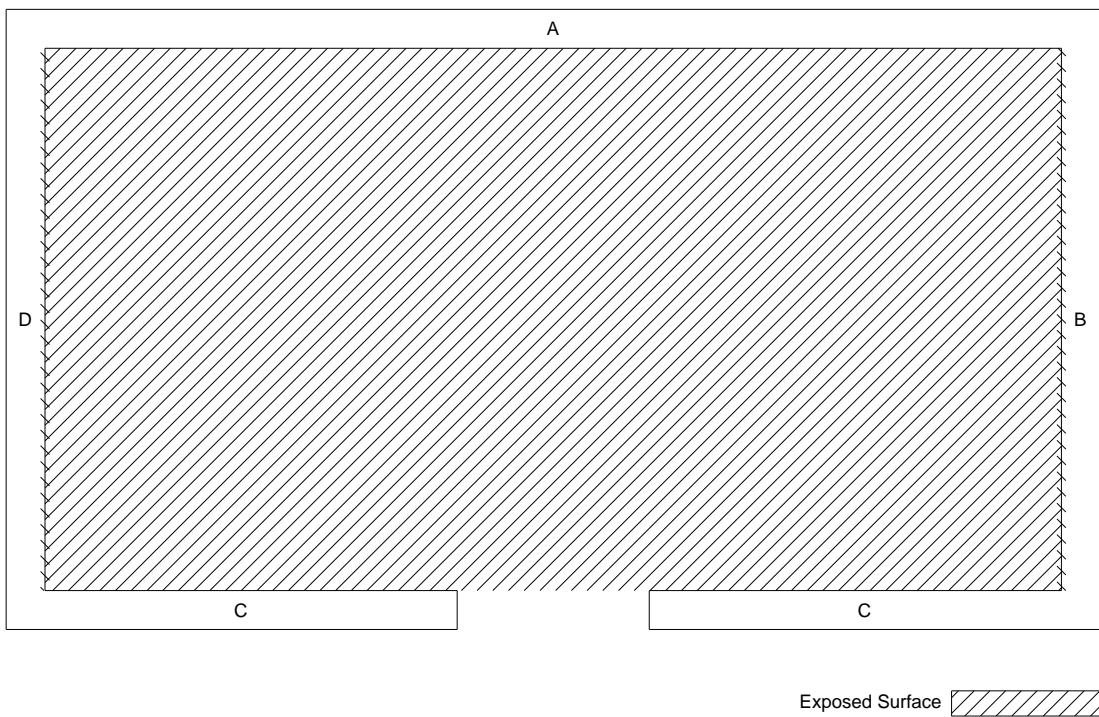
Schematic – fully exposed ceiling, Wall B and Wall D for Test NLT-3 and Test NLT-4.
